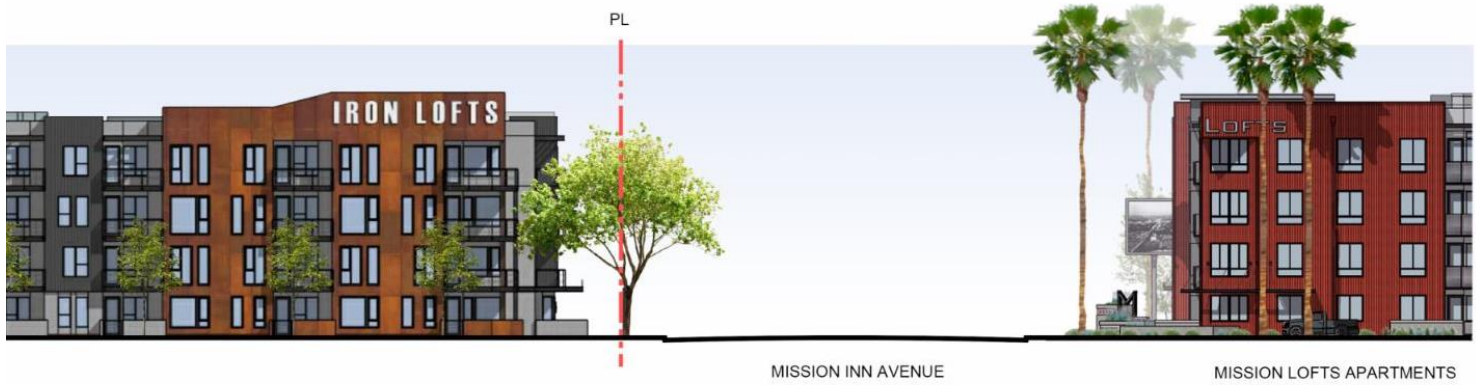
Detail, West façade Commerce Street elevation and site context of the existing Mission Lofts Apartments
